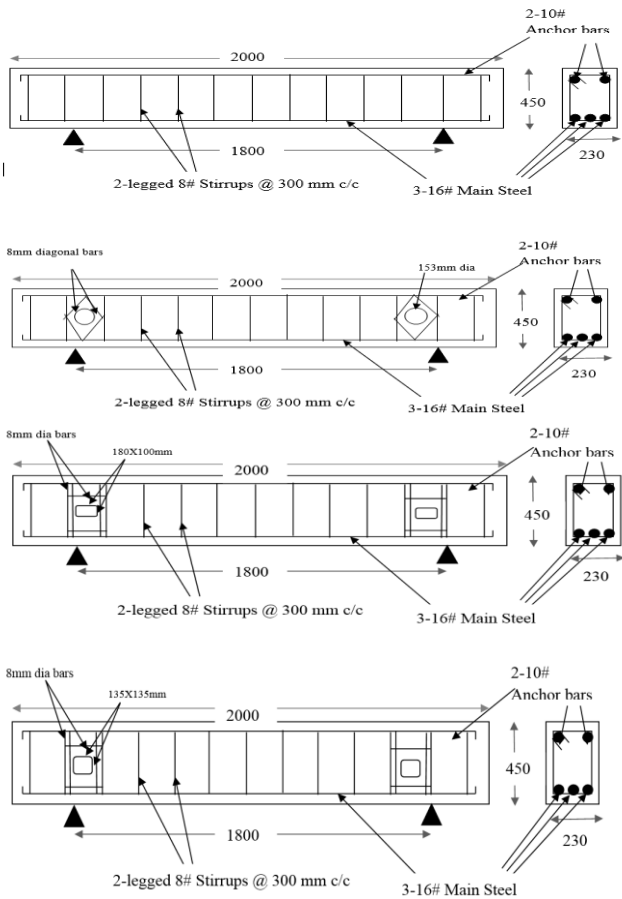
Reinforcement Details of Conventional RC beam, Circular, Rounded Rectangular and Rounded square Openings
